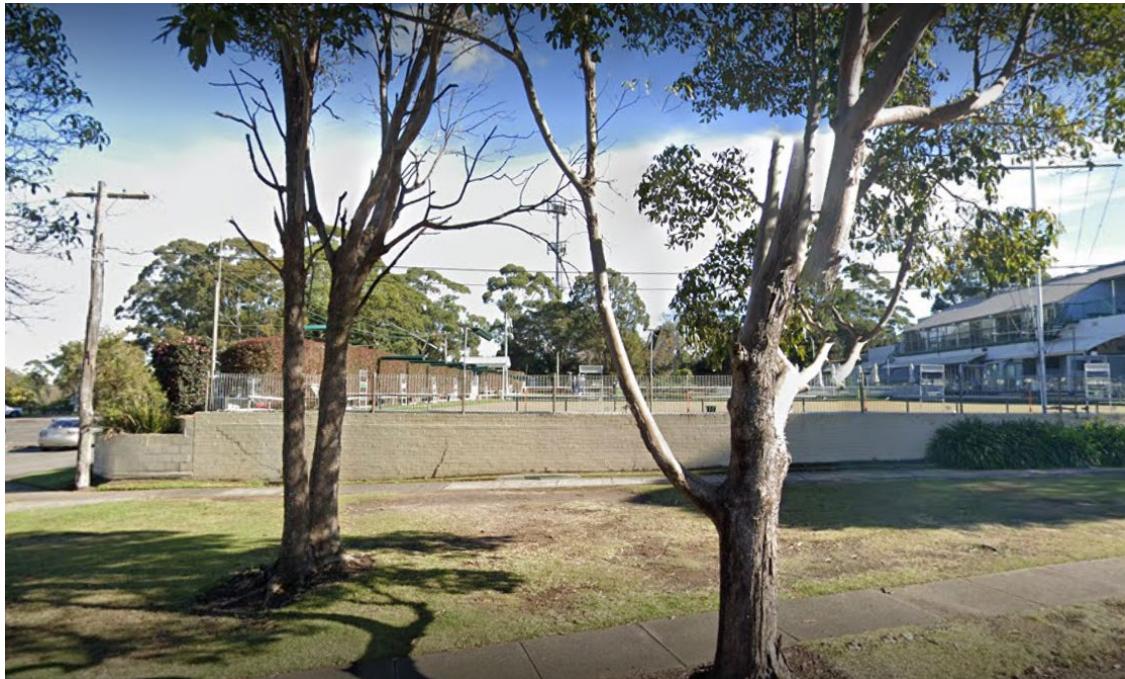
Google Maps view of the mortared brick retaining wall at the southeastern corner of the site, prior to painting, detailing existing cracking.
